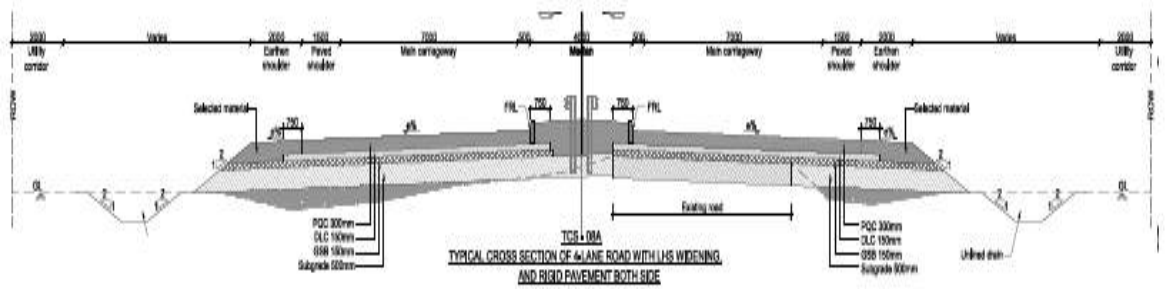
TCS-8A 4-lane road with LHS widening and rigid pavement both side
